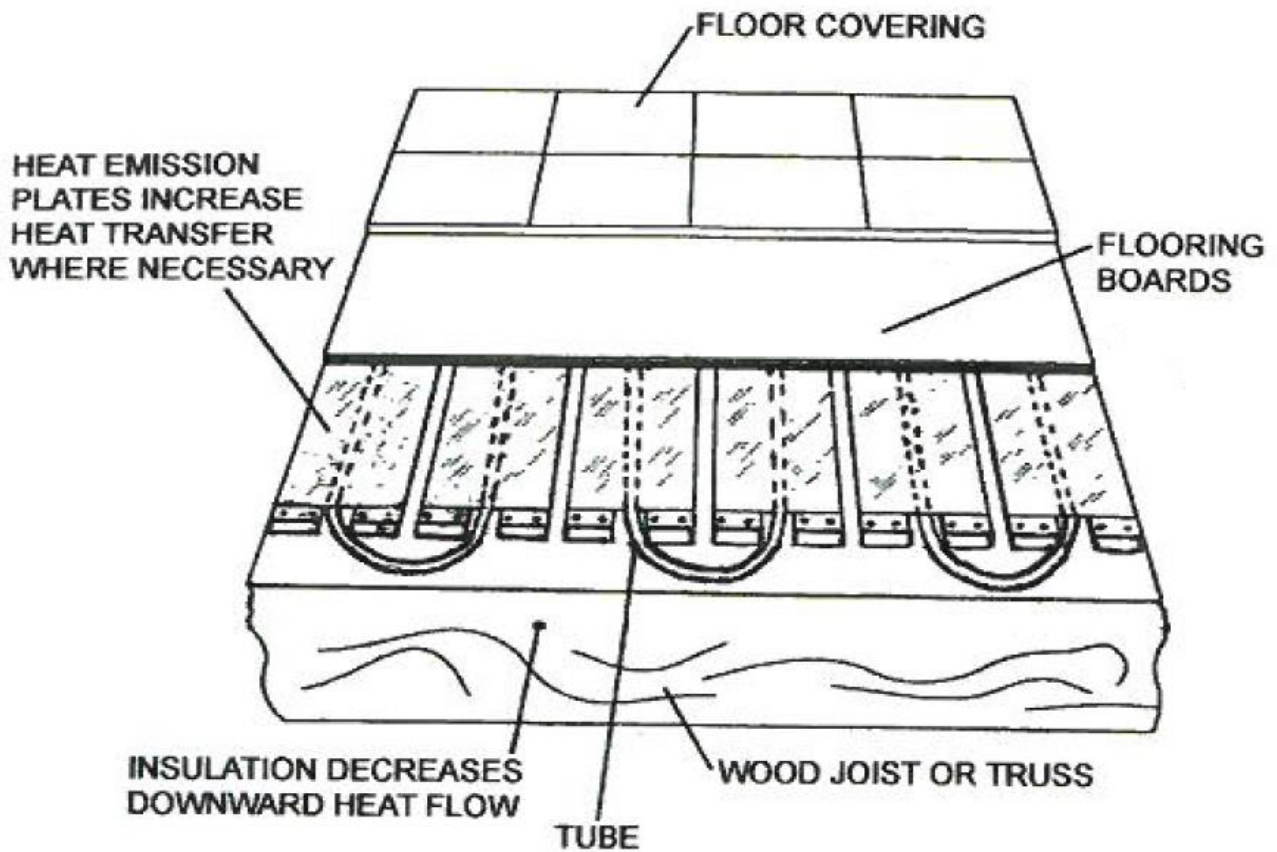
Type G under floor heating system with pipe embedded in wooden floor.
